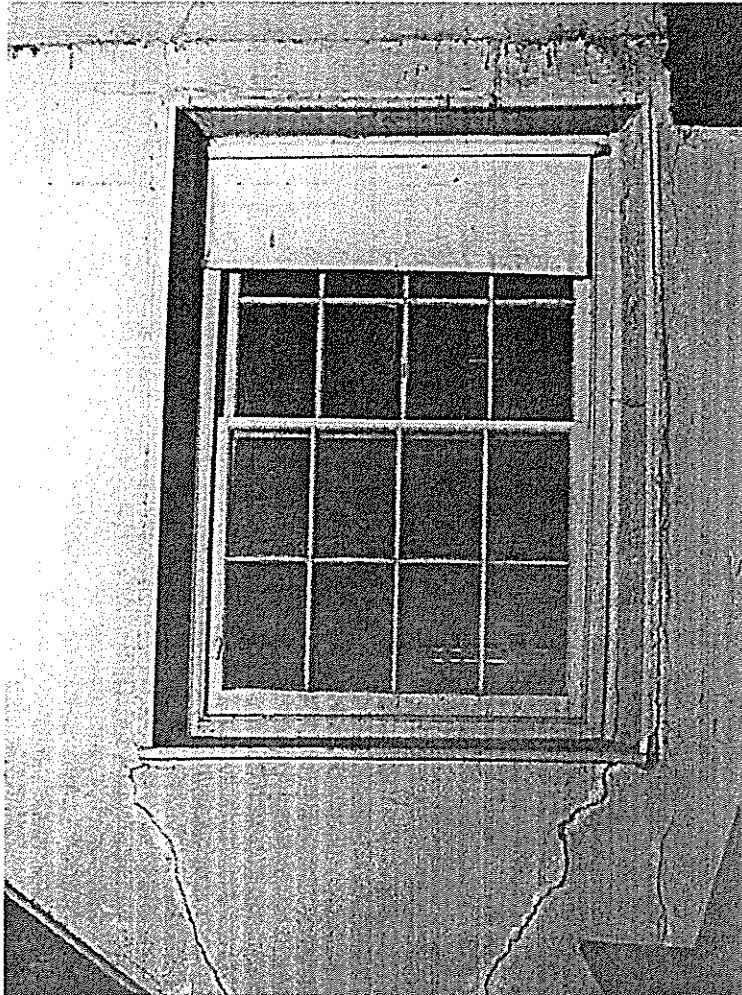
Interior Window View. Cracks in the masonry wall are affecting window casings and interior finishes. Deformation has caused the head casings to bow downward, while water infiltration has deteriorated plaster finishes. The windows themselves are in remarkably good condition, however. (Image taken: 11/97)
